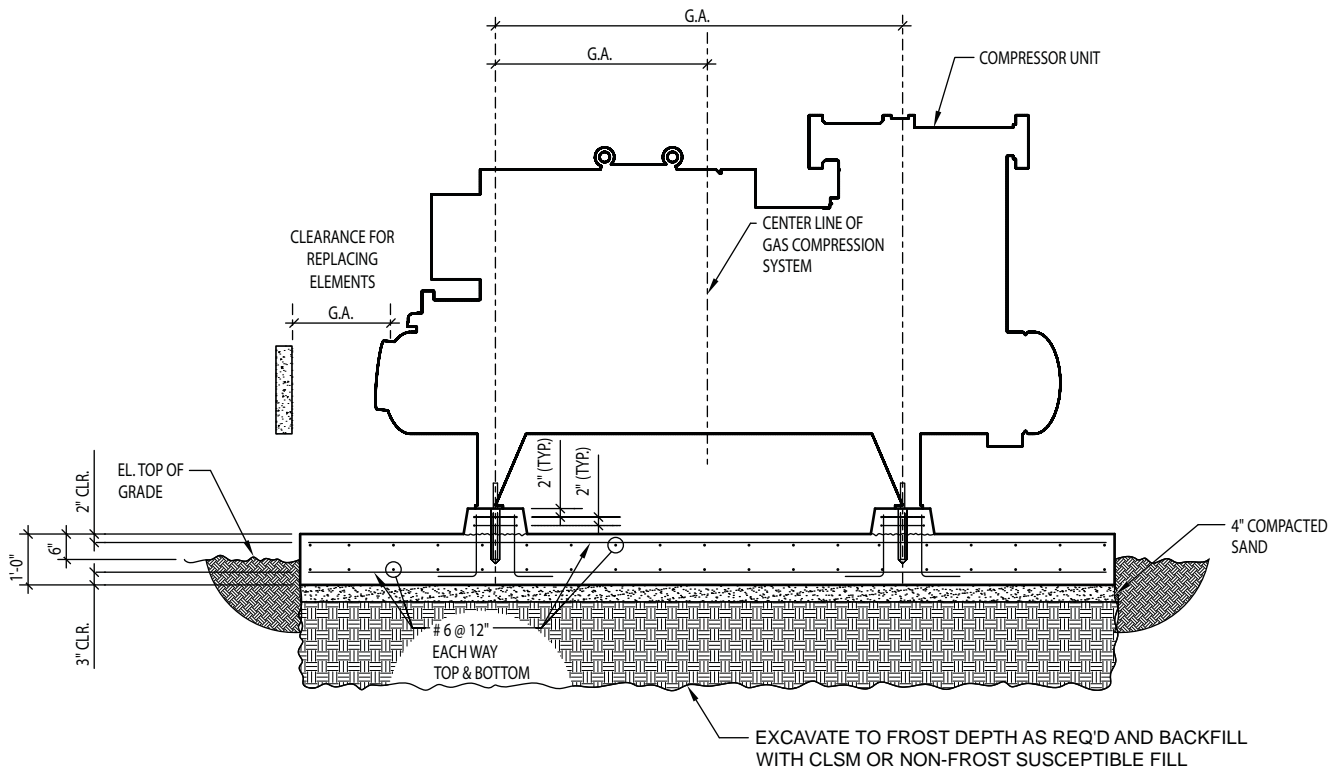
Concrete Pad with Compressor Unit Dimensions - Side View
